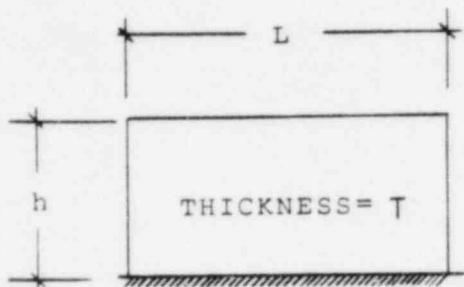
(A) SECTIONAL PROPERTIES OF WALL
